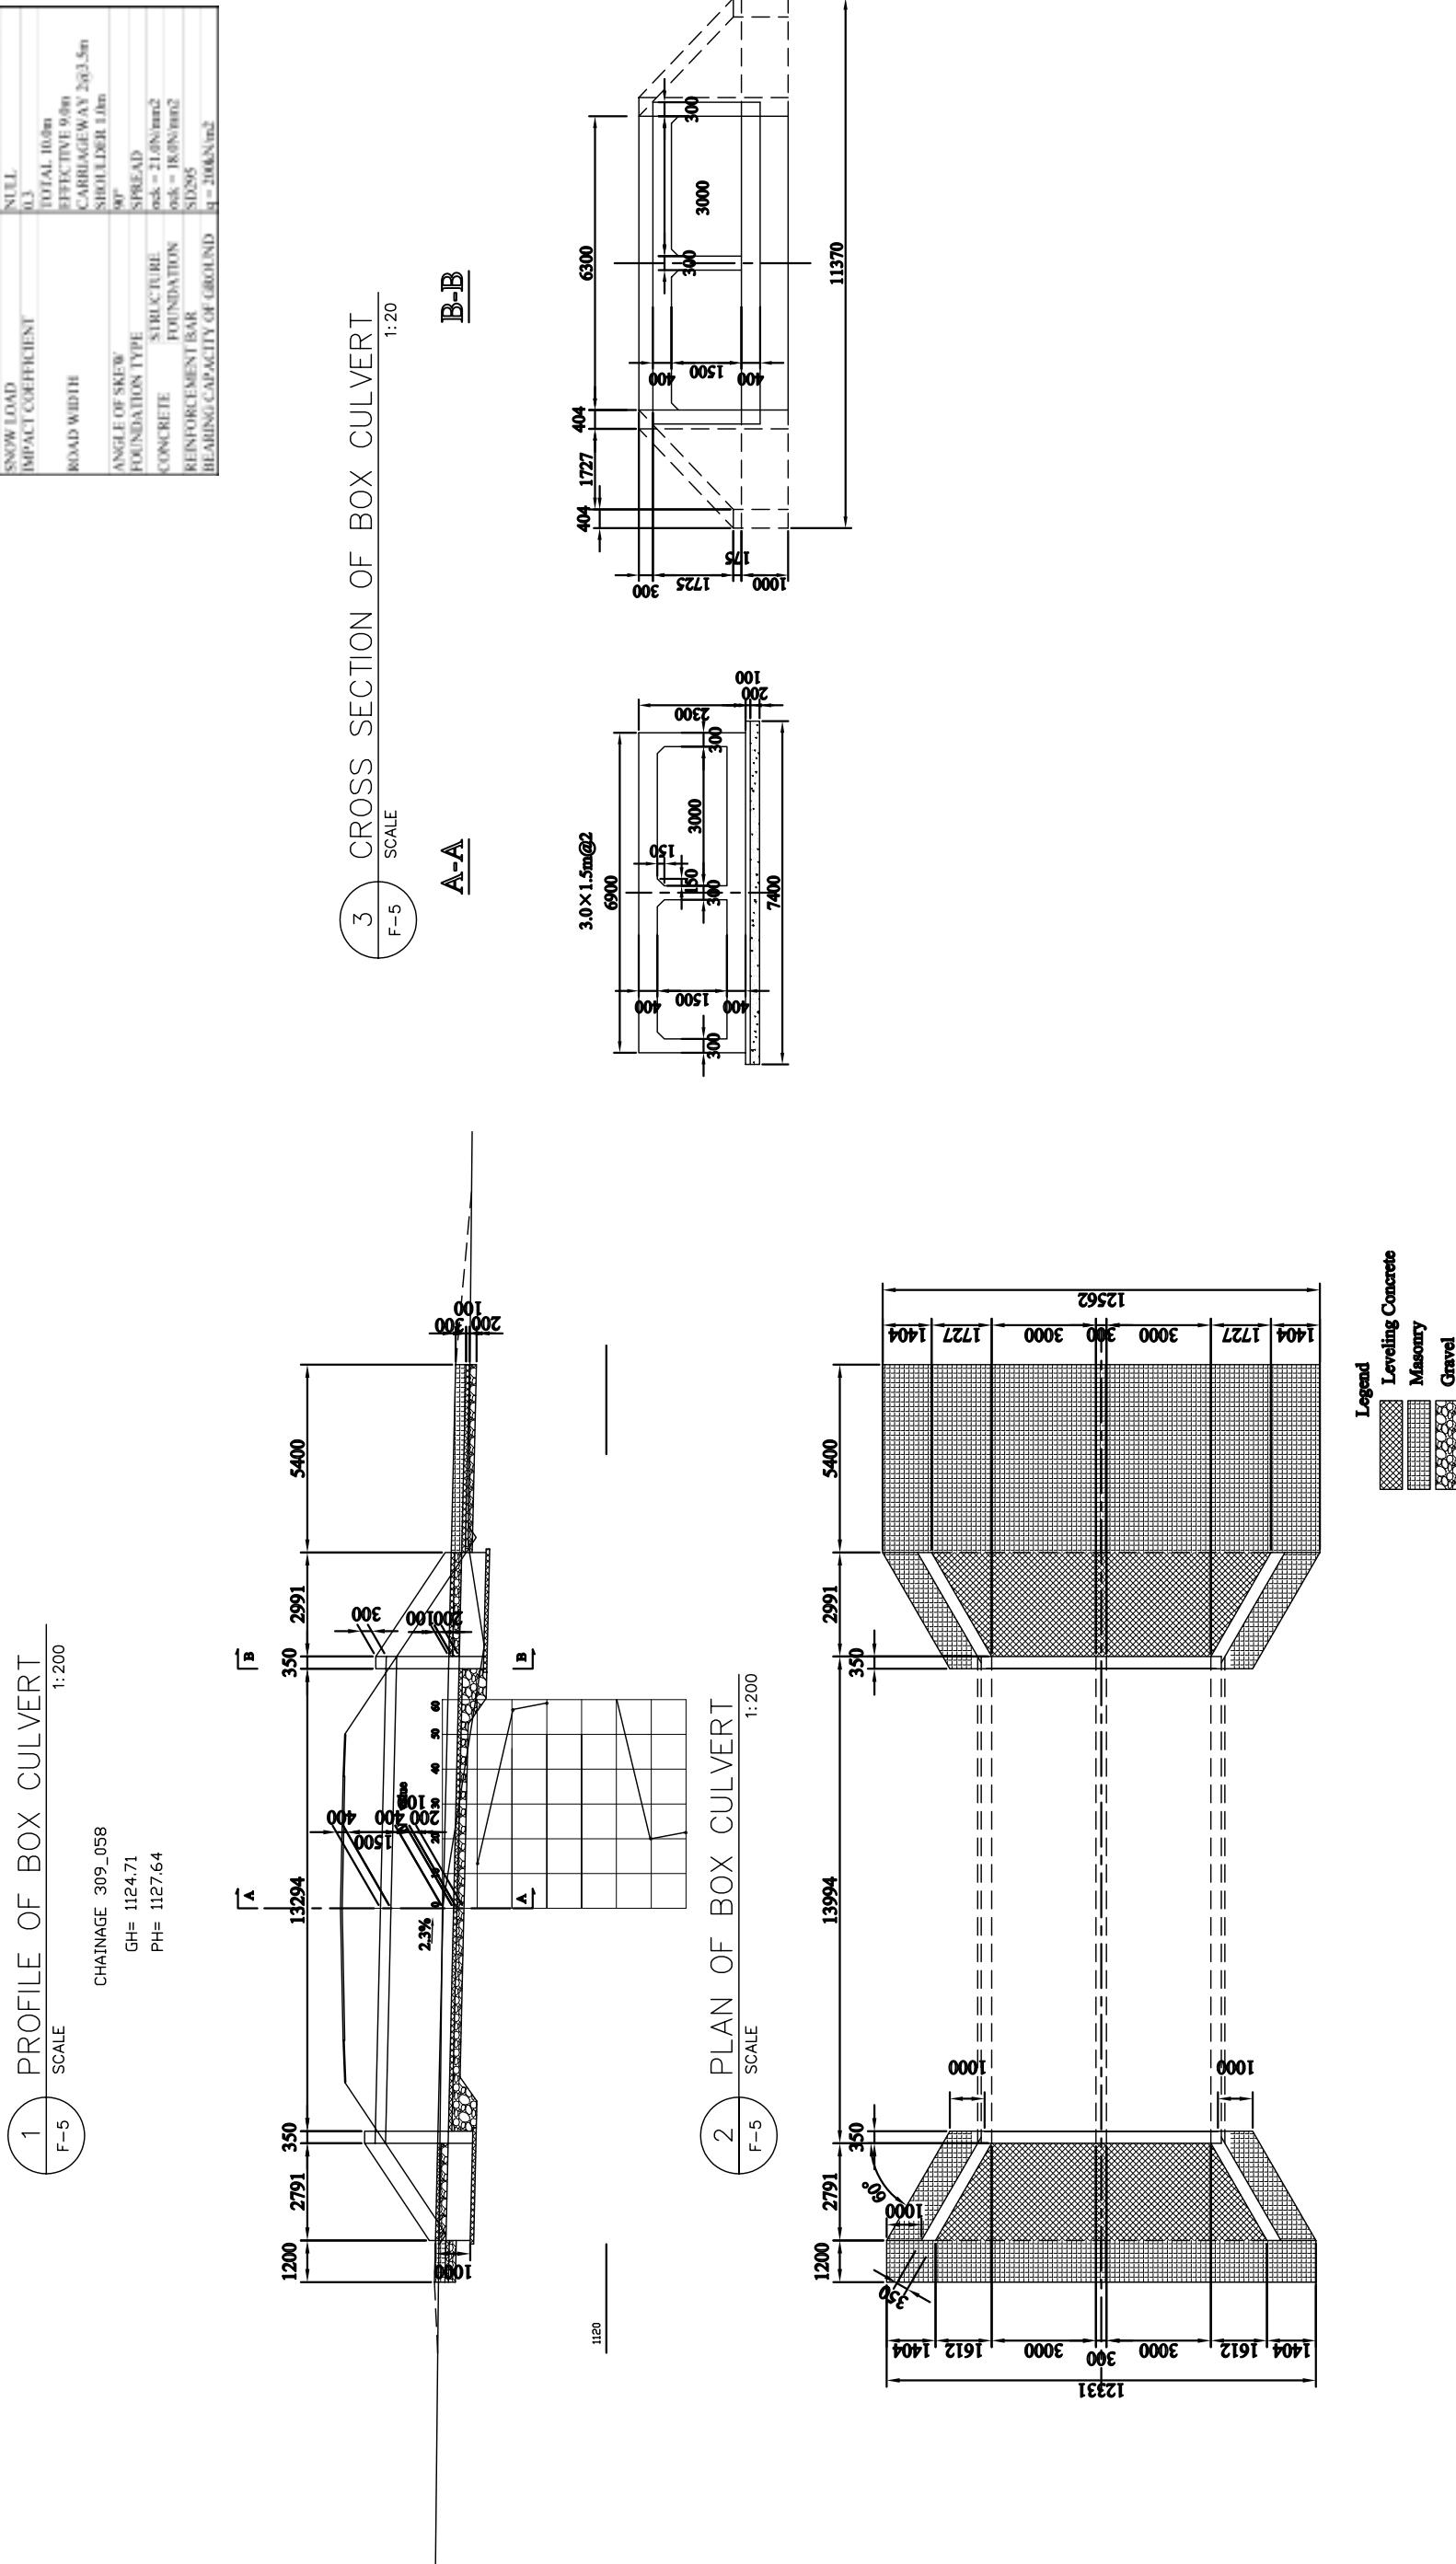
General View of Box Culvert(BC2 Sta.309+058)
